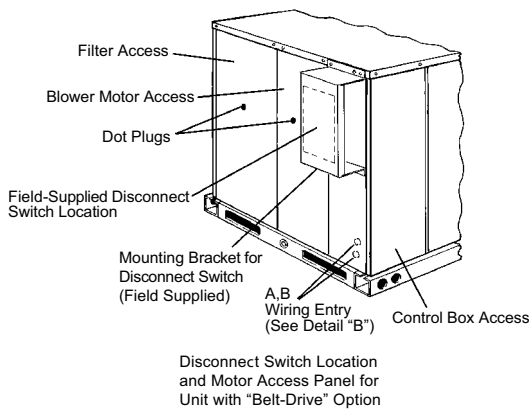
DISCONNECT/BLOWER ACCESS LOCATION
